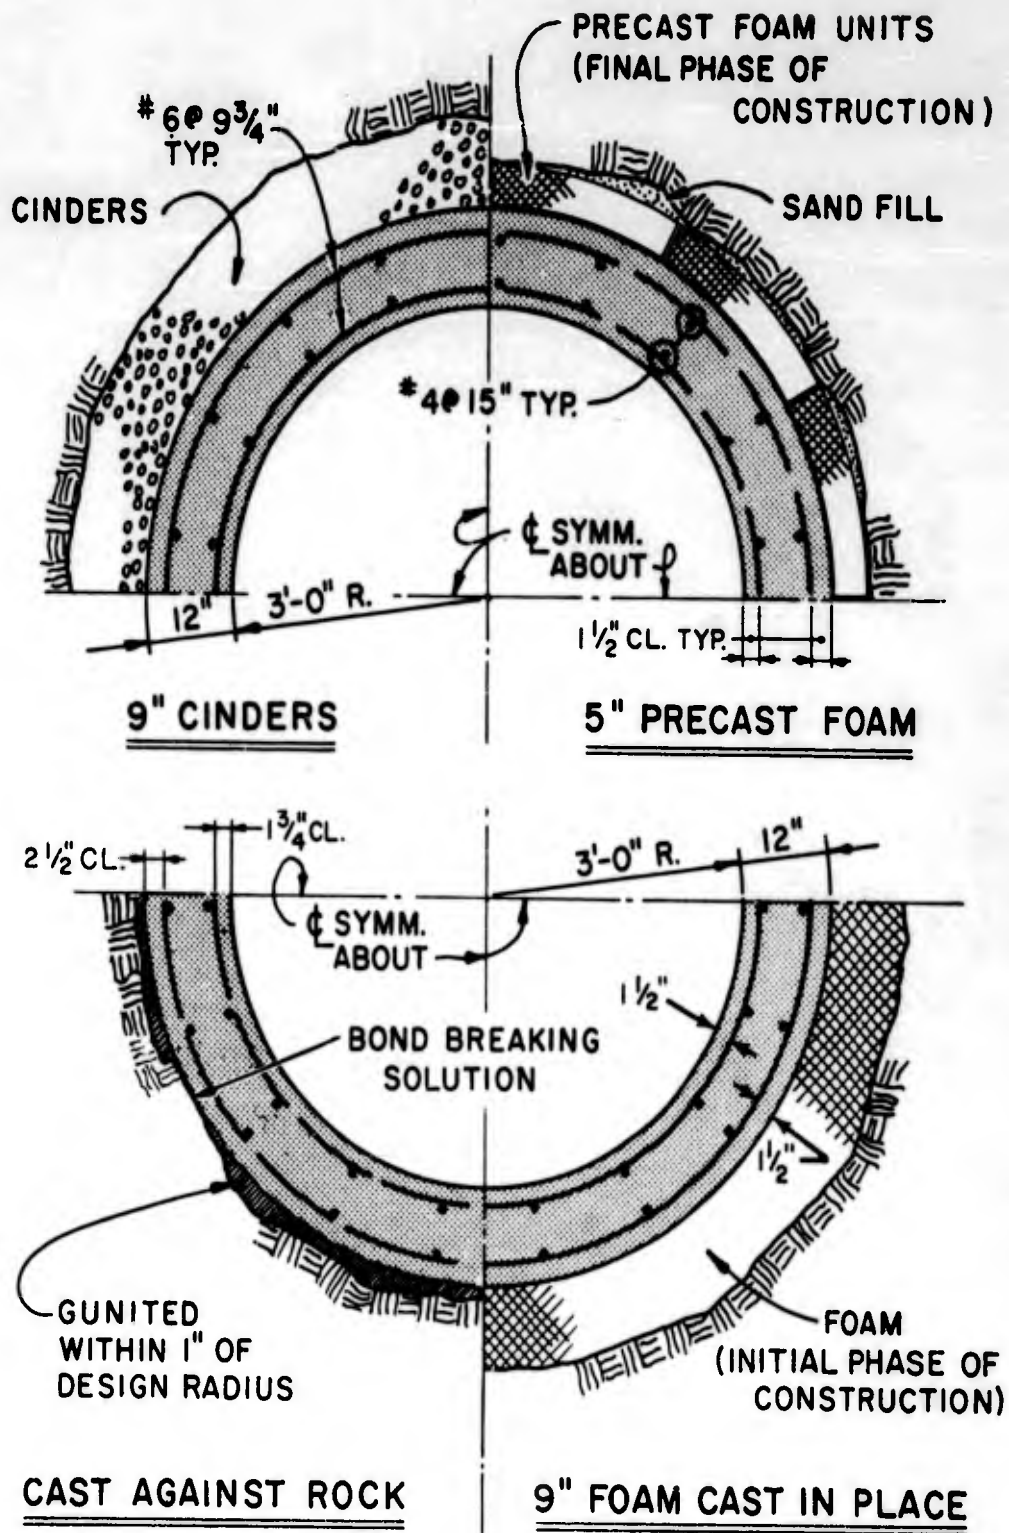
Quarter sections of four types of 12-inch reinforced concrete liners.
